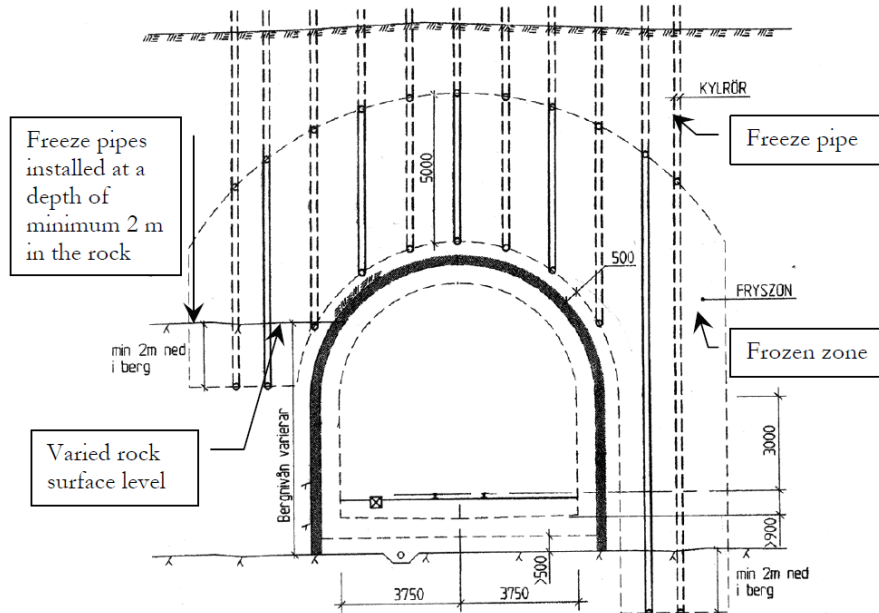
Tunnel section with a circular arc, showing various installation depths of freeze-tubes (from Johansson (2009))
